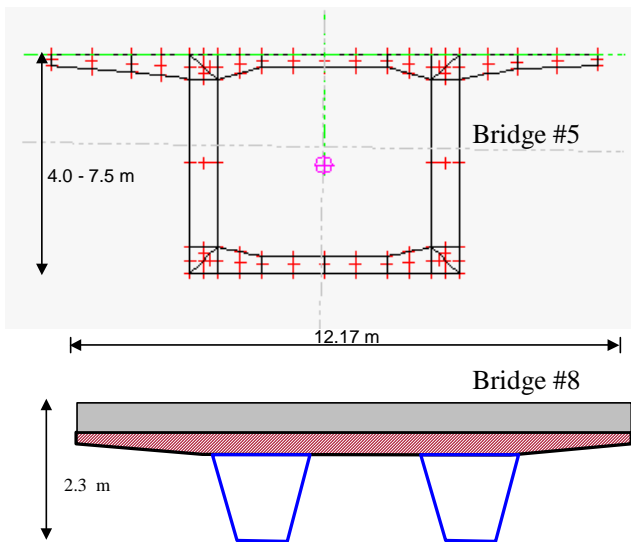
Cross-sections of the main girders of bridge #5 and bridge #8.
